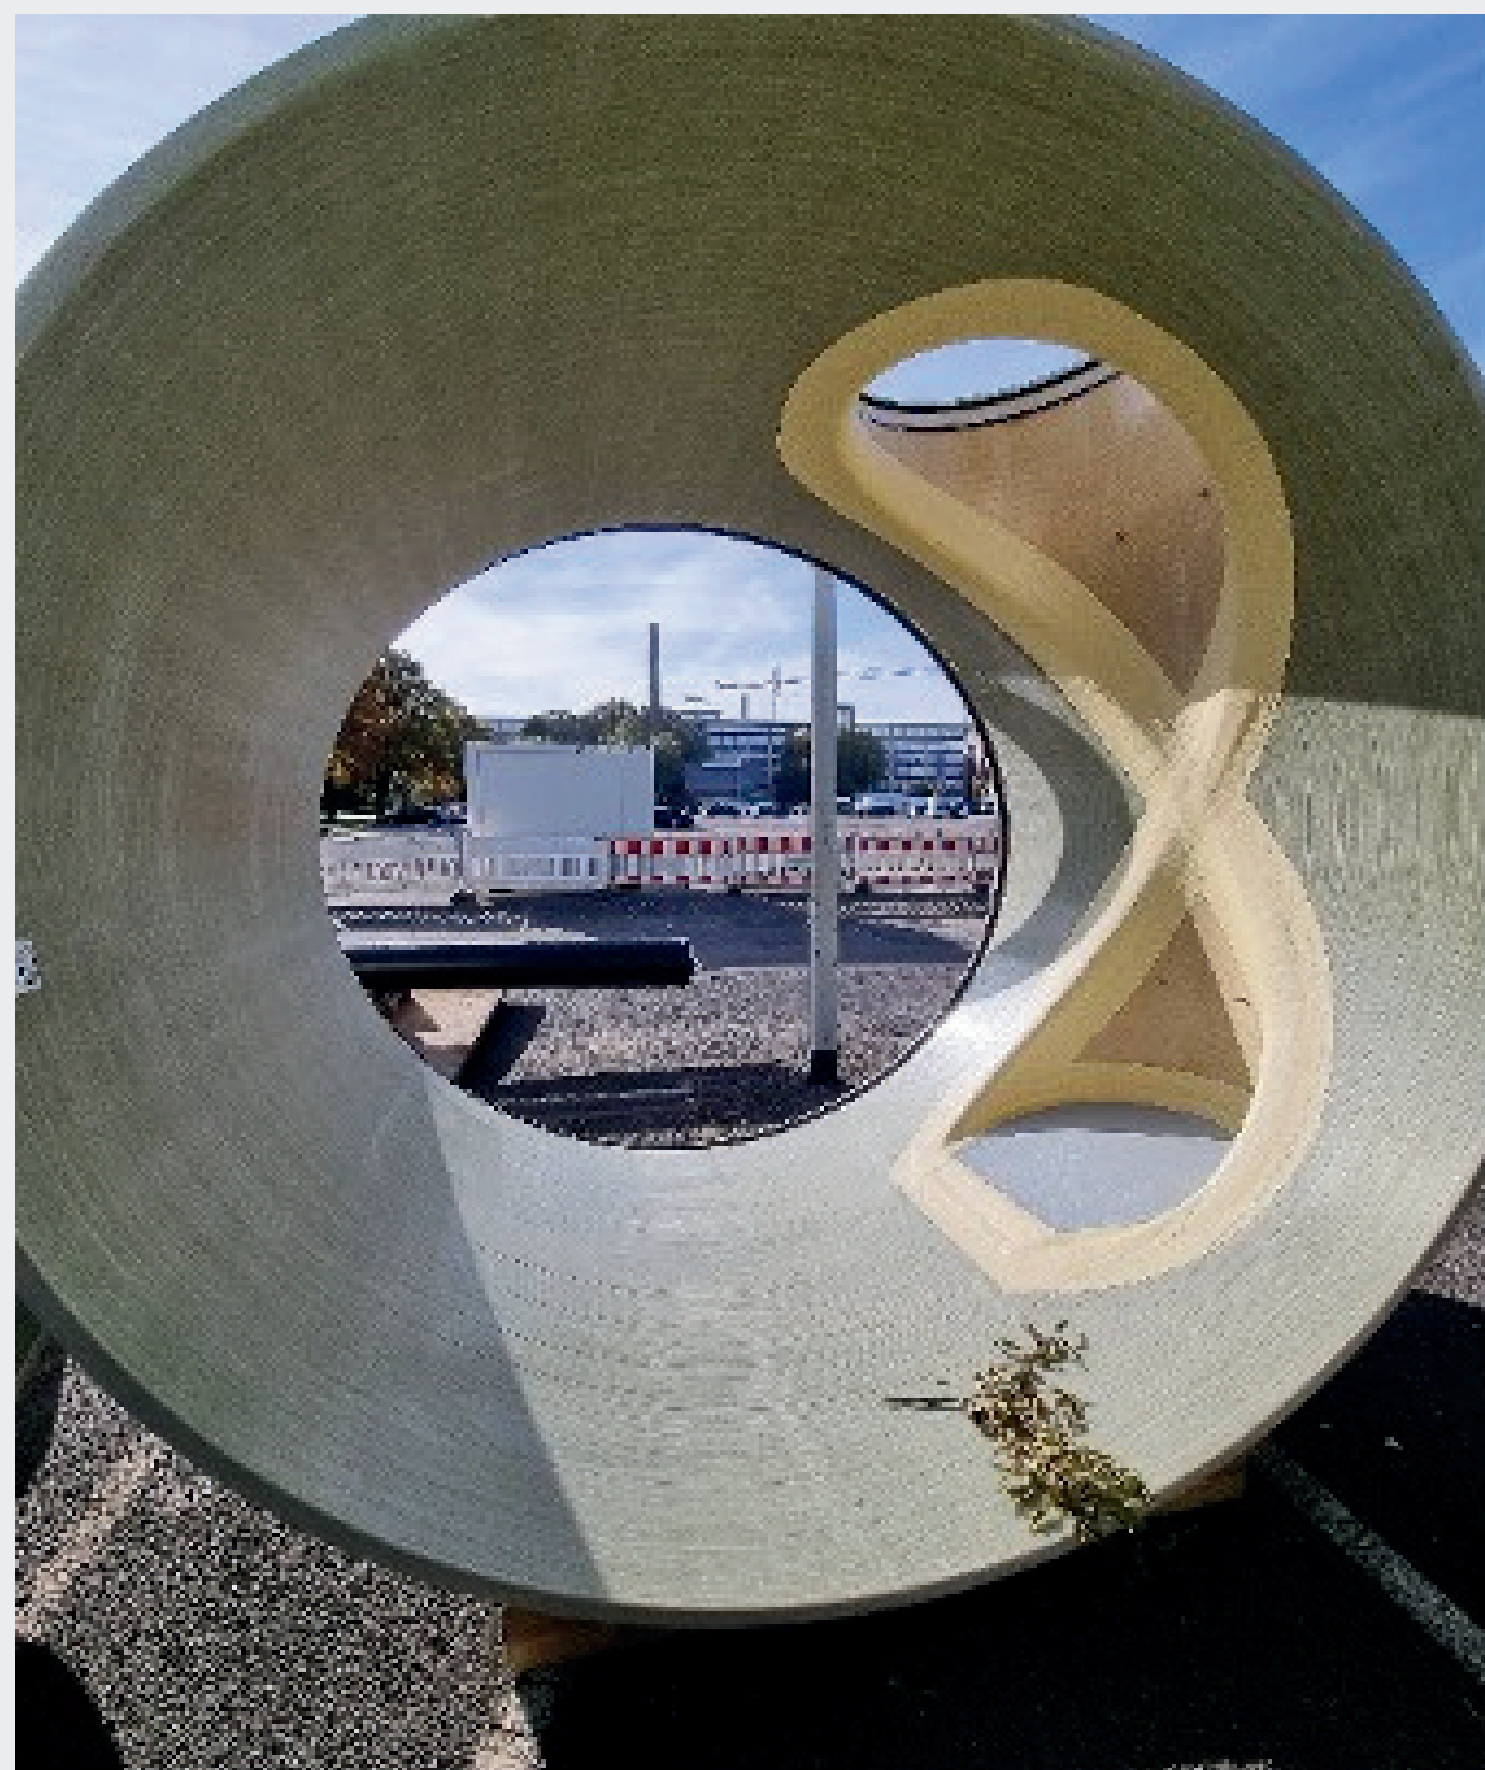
GRP tank sewer pipe with integrated tangential manhole
